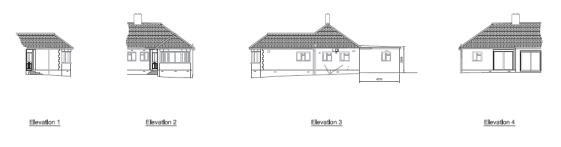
Proposed Elevations (please note – larger version of plan can be found in the Committee Plan Pack)
